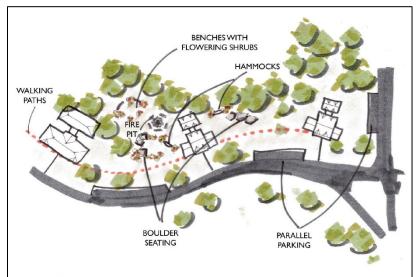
Cottage Extension and Outdoor Spaces (Unknown Creator)
